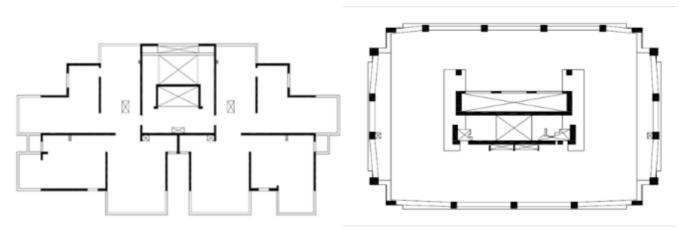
Typical residential building and typical office building. Source: Lagos & Kupfer, 2012
